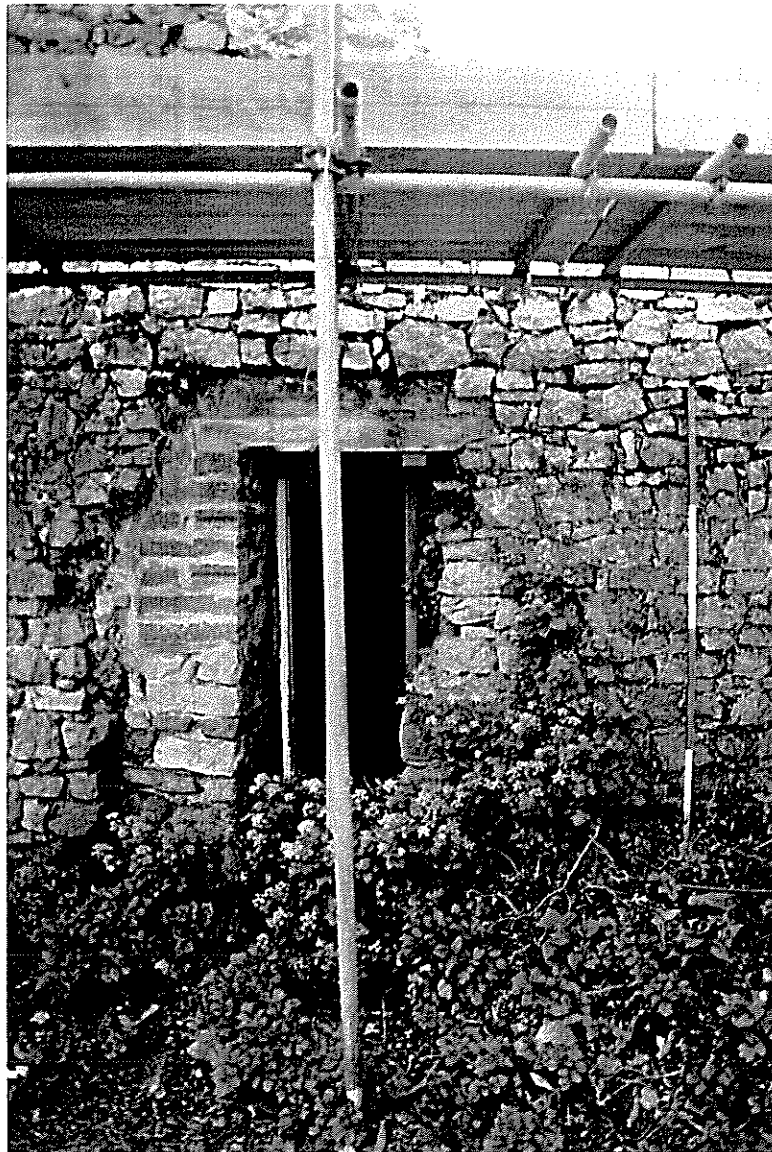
Lydstep Palace, Room 2 interior: North wall
